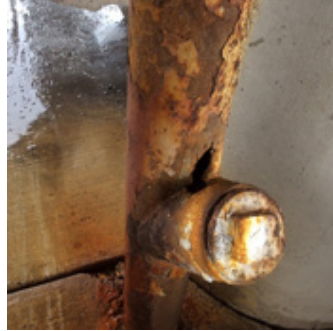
A rusted through steel pipe illustrates the primary benefit of FRP drains
